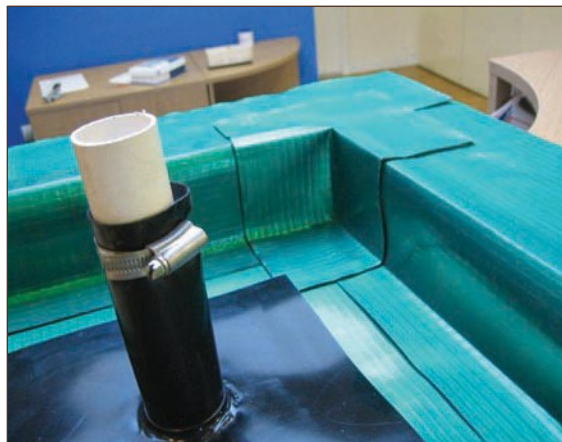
Prefabricated corner detail and top hat (courtesy A Proctor Group)
